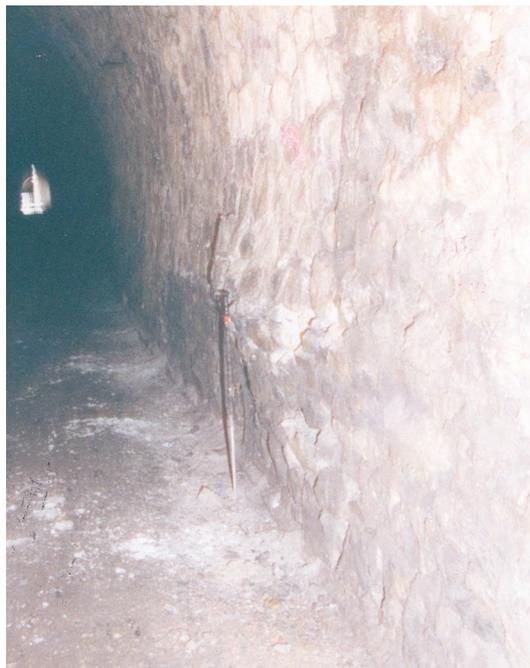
bulging nearing the stage of permanent damage (significantly deteriorated masonry)
